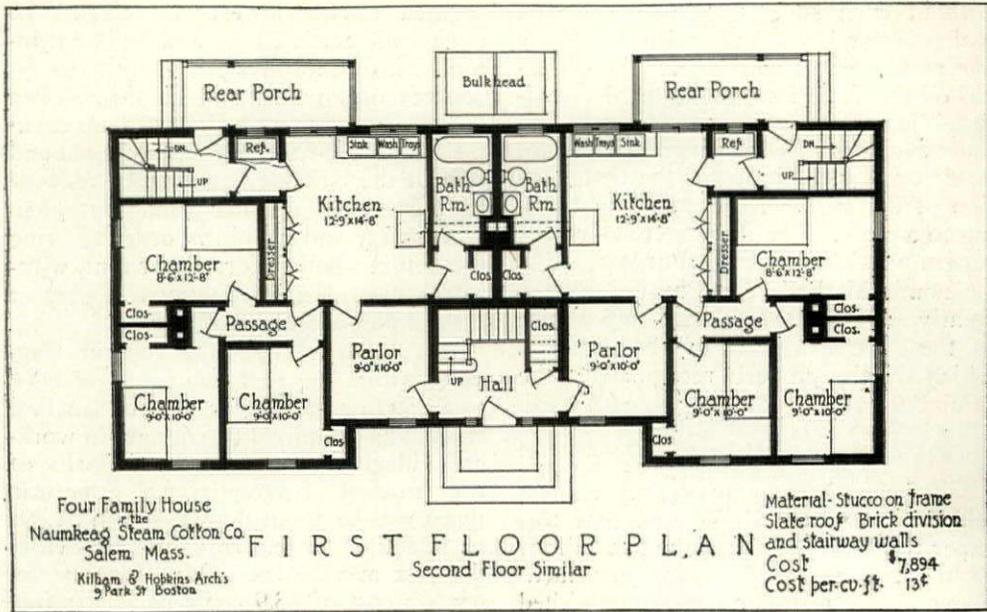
FLOOR PLAN OF FOUR-FAMILY HOUSE—MASSACHUSETTS HOMESTEAD COMMISSION HOUSES, SALEM, MASS.
